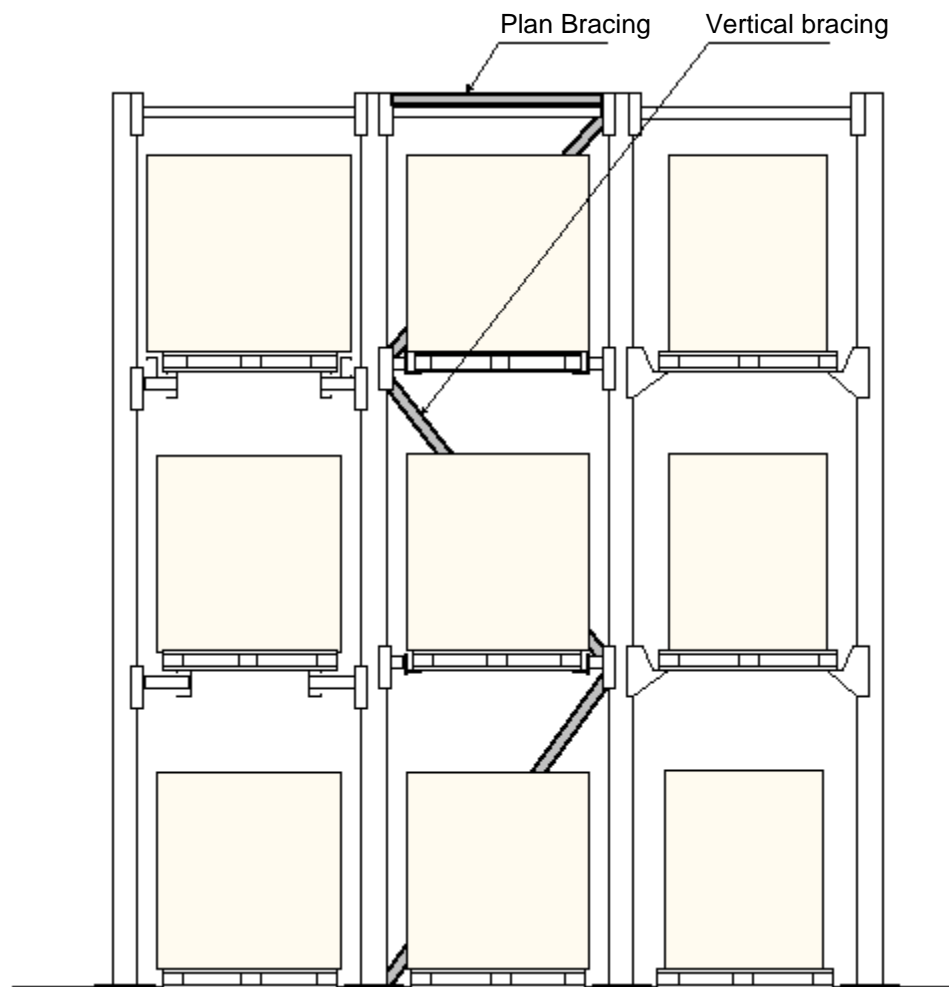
Typical configuration of a braced Drive-In Rack structure (various types of side arms and pallet rails are shown)
